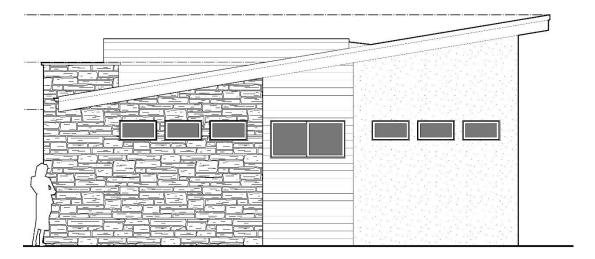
Proposed elevation of carriage house as viewed from the rear lane.
